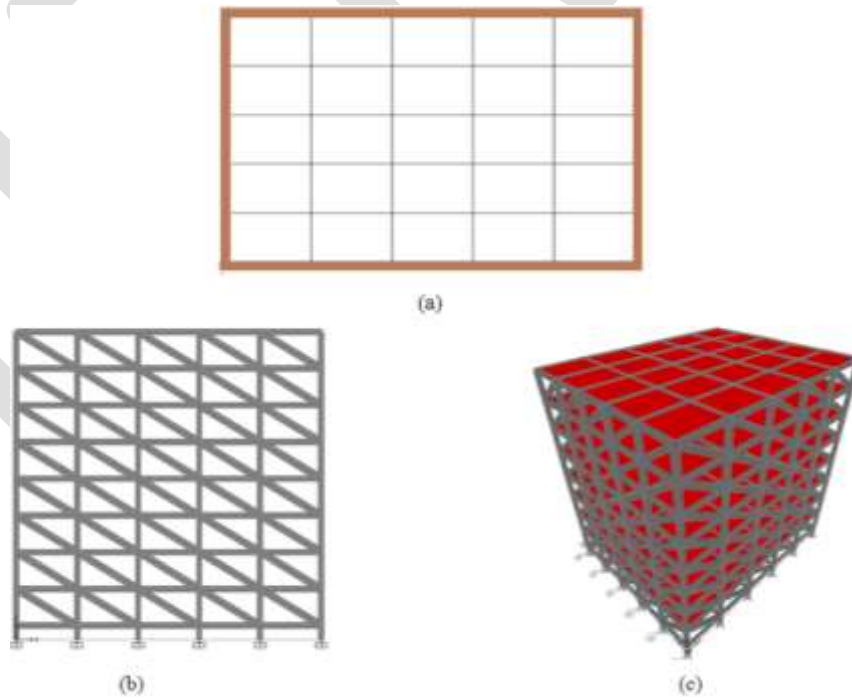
Arrangement of infill wall (a) plan (b) elevation (c) 3-D view
